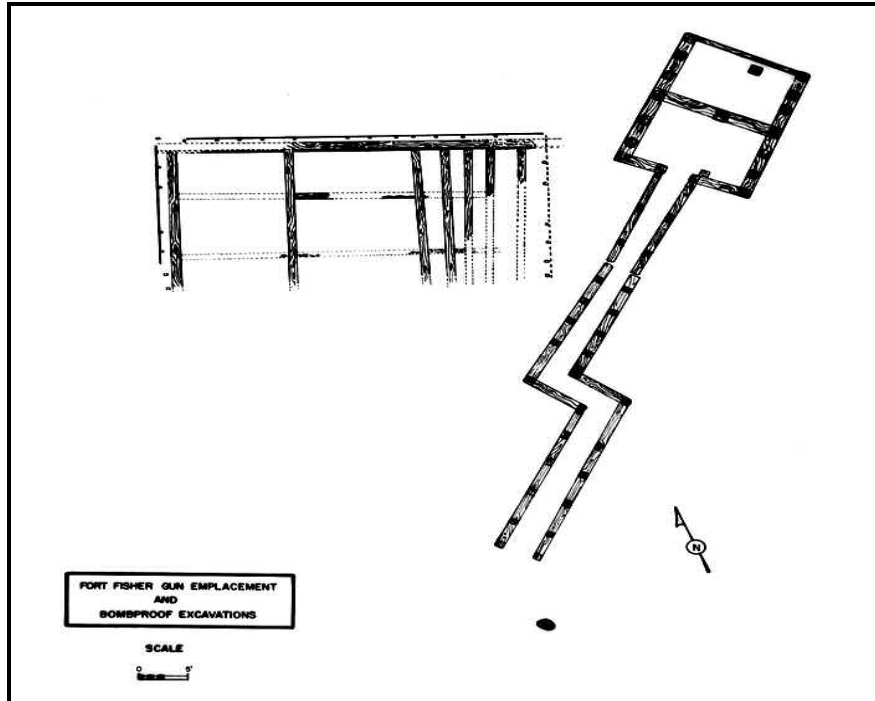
Artistic reconstruction of the gun emplacement and bombproof excavations.
